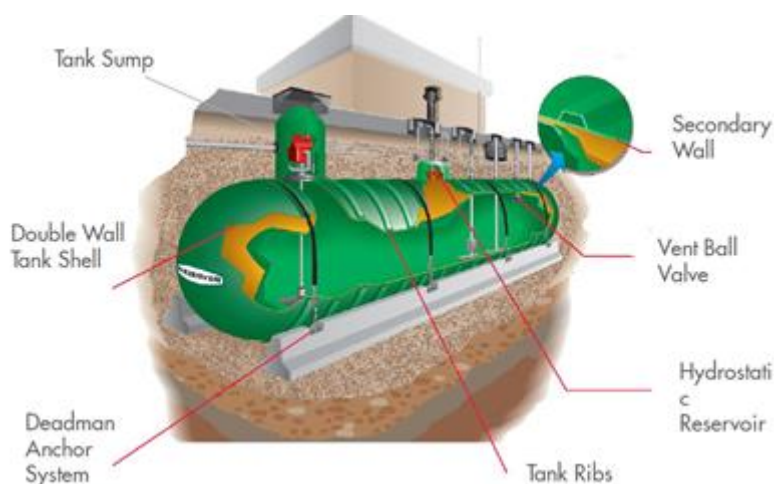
Underground Double-Wall Storage Tank (fiberglass reinforced plastic).
